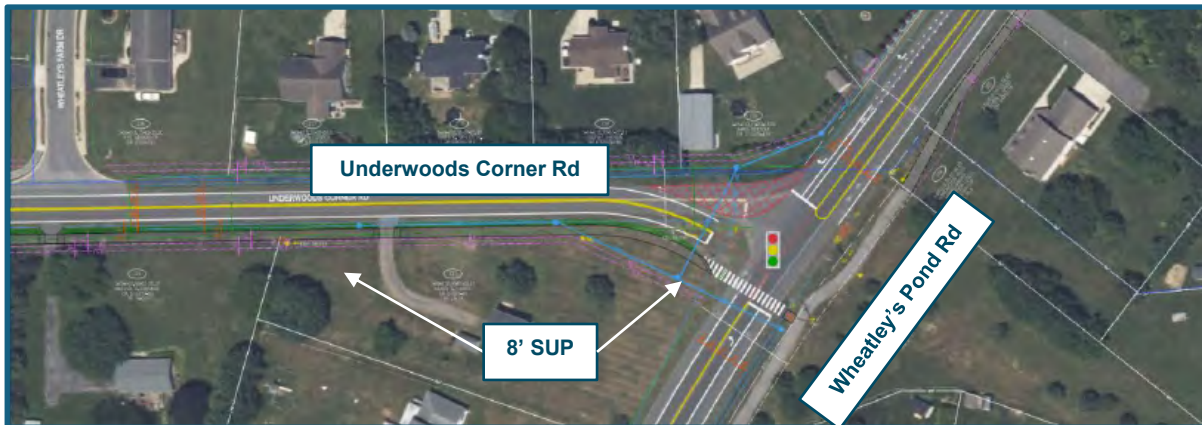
Intersection at Wheatley's Pond Road and Underwoods Corner Road – Signalized with Realignment
